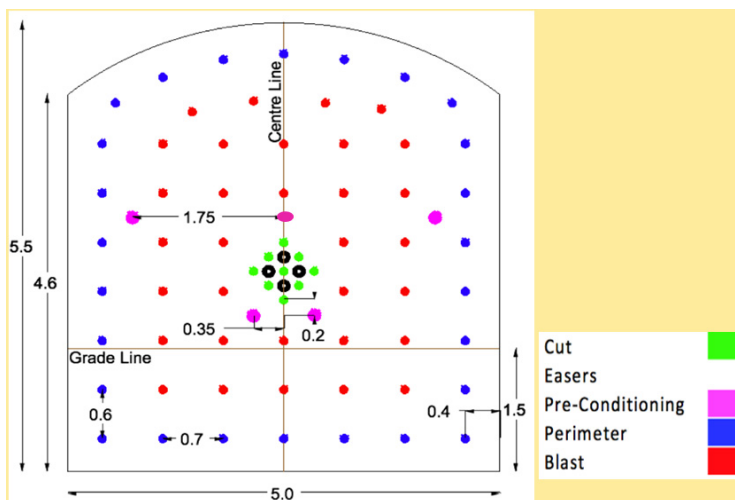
Schematic view of fully drilled mining face with Four-face perpendicular preconditioned practice
